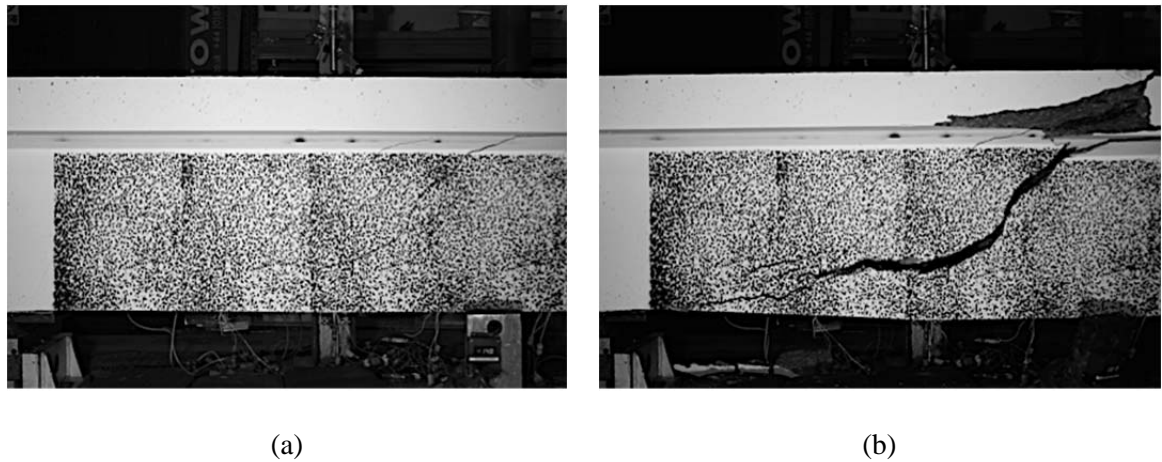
Deep embedment specimen LBDE during testing: (a) initial shear crack inclination, (b) failure mode.
